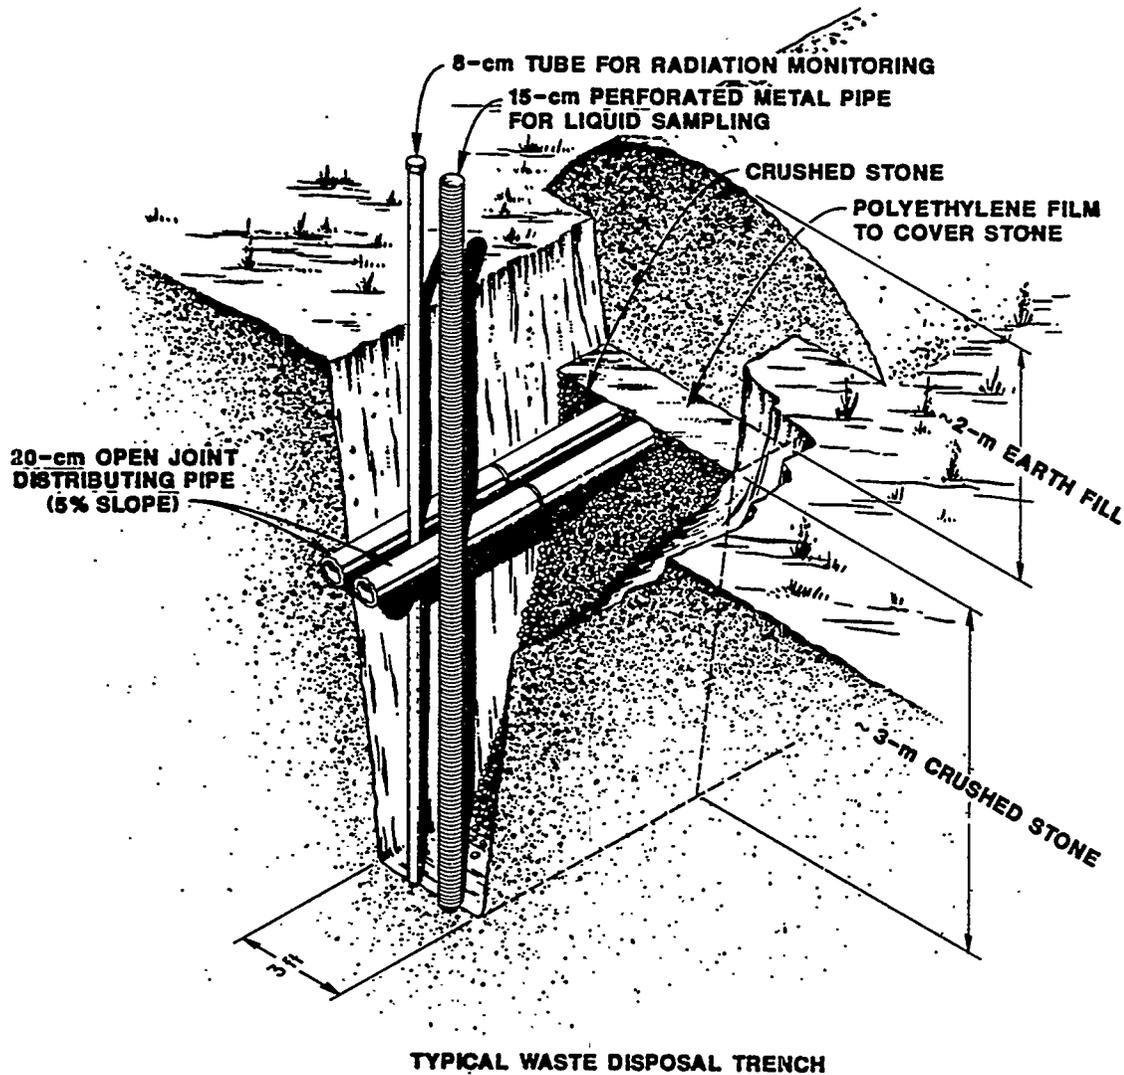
Construction details of ORNL liquid waste disposal Trench 7.
